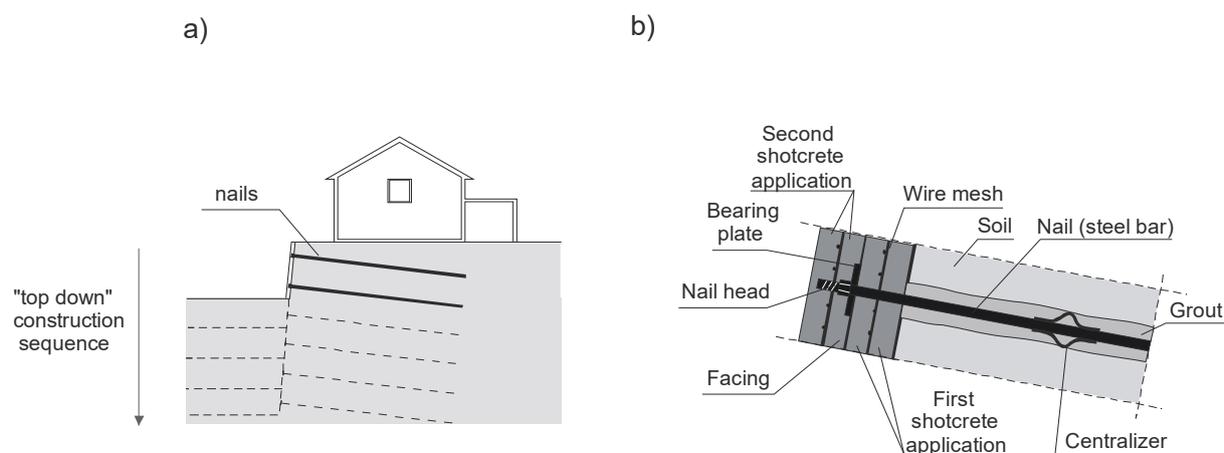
Soil nailing: a) construction sequence, b) typical soil nail detail
